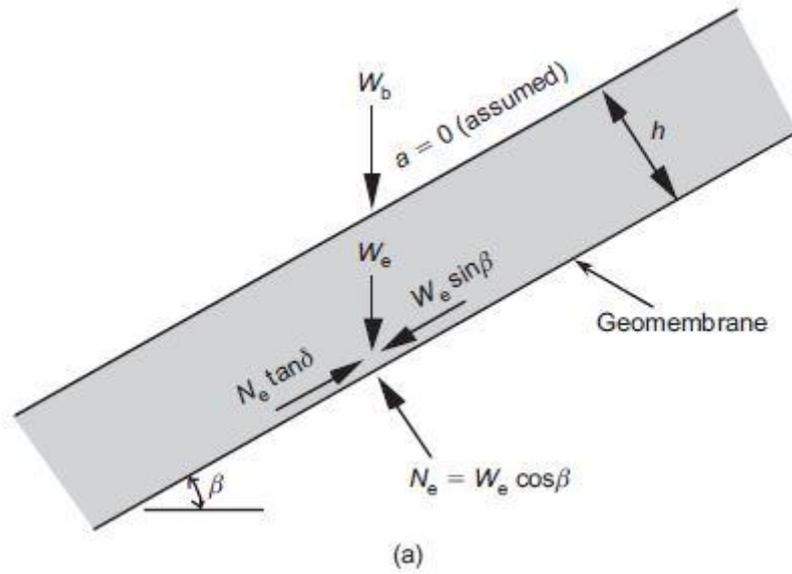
Balance of forces with equipment backfilling up slope (Koerner and Soong, 2005)
